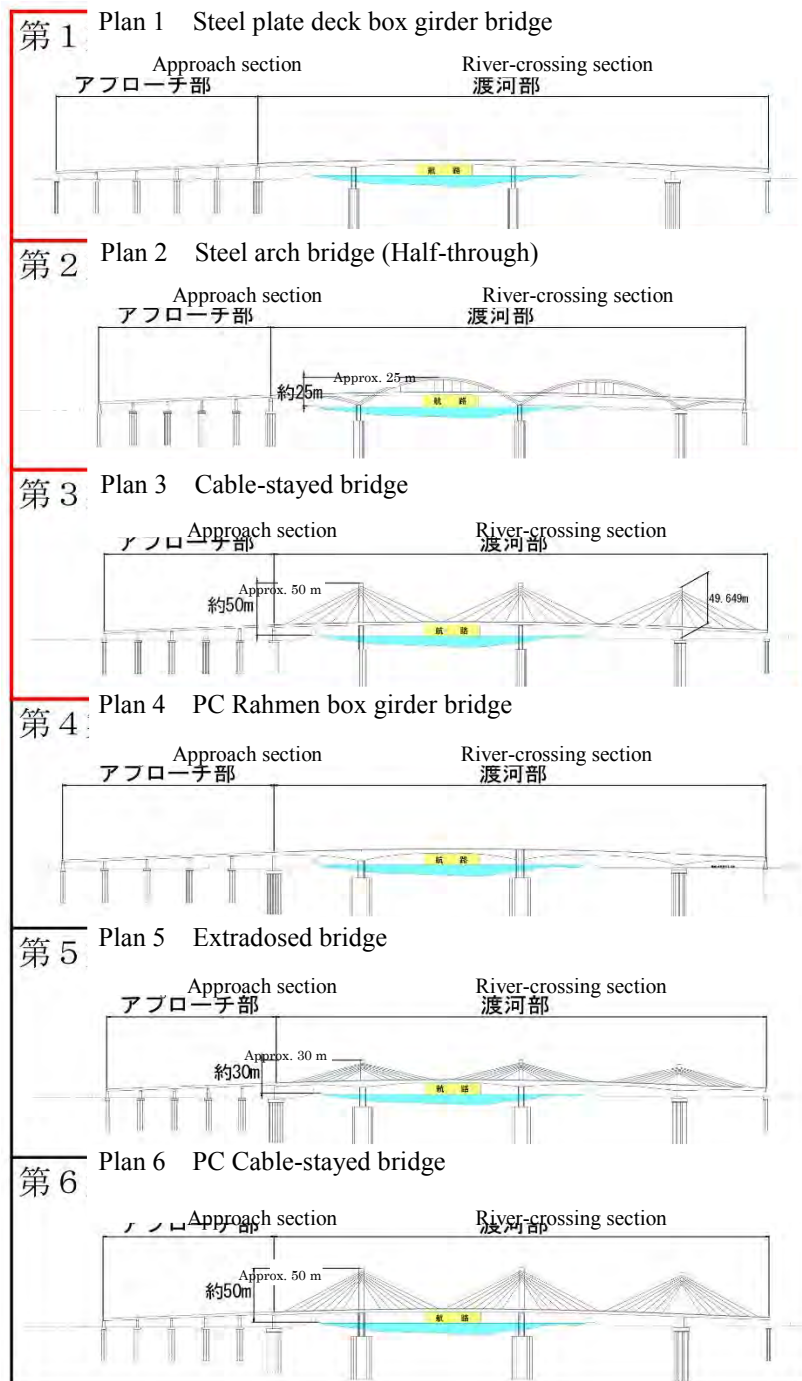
Six Bridge Types Applicable to the Bridging Position
